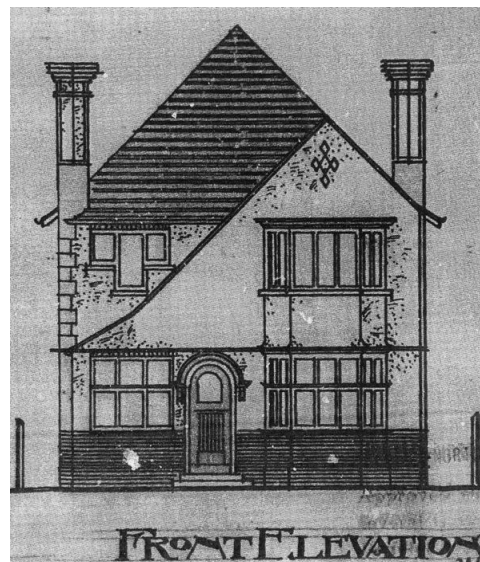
Front elevation of no. 10, 'The Nook', 1909 (LBH Planning Dept)
